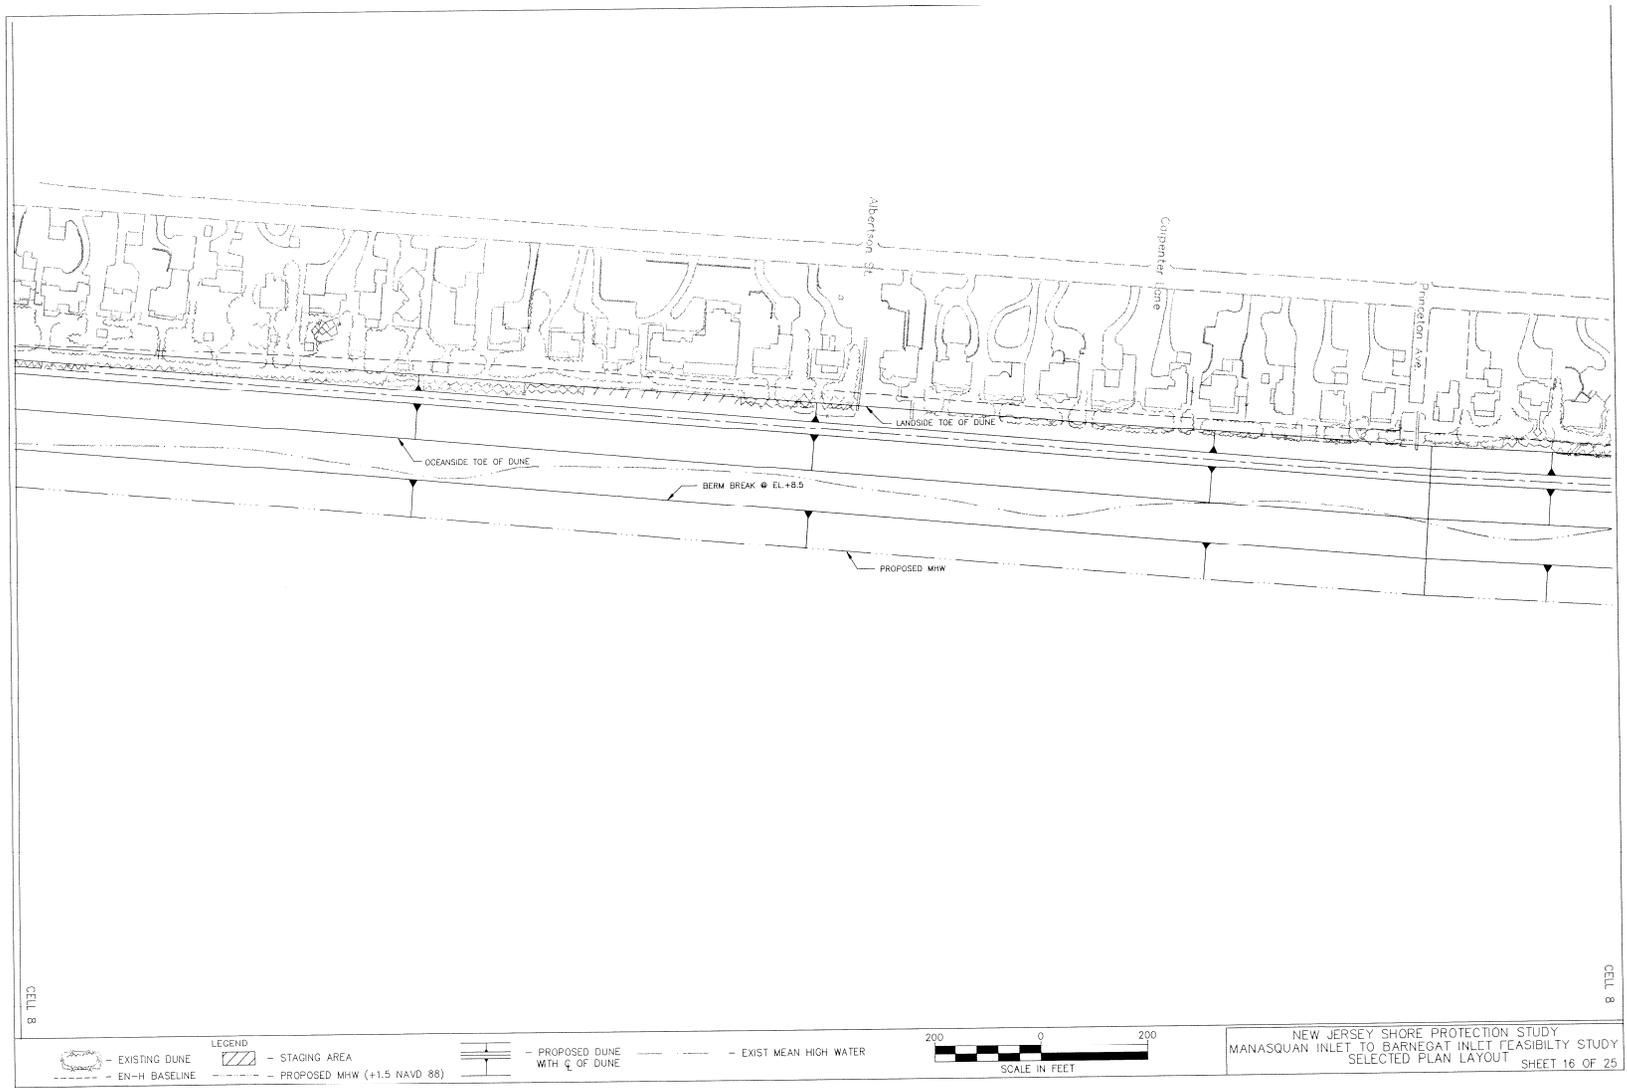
Selected Plan Layout – Mantoloking Borough, South of Princeton Avenue
